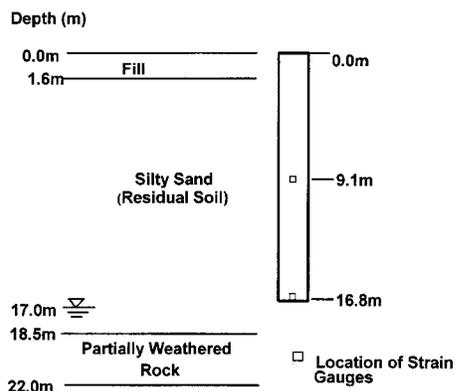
Soil profile at Piedmont pile location and pile instrumentation
